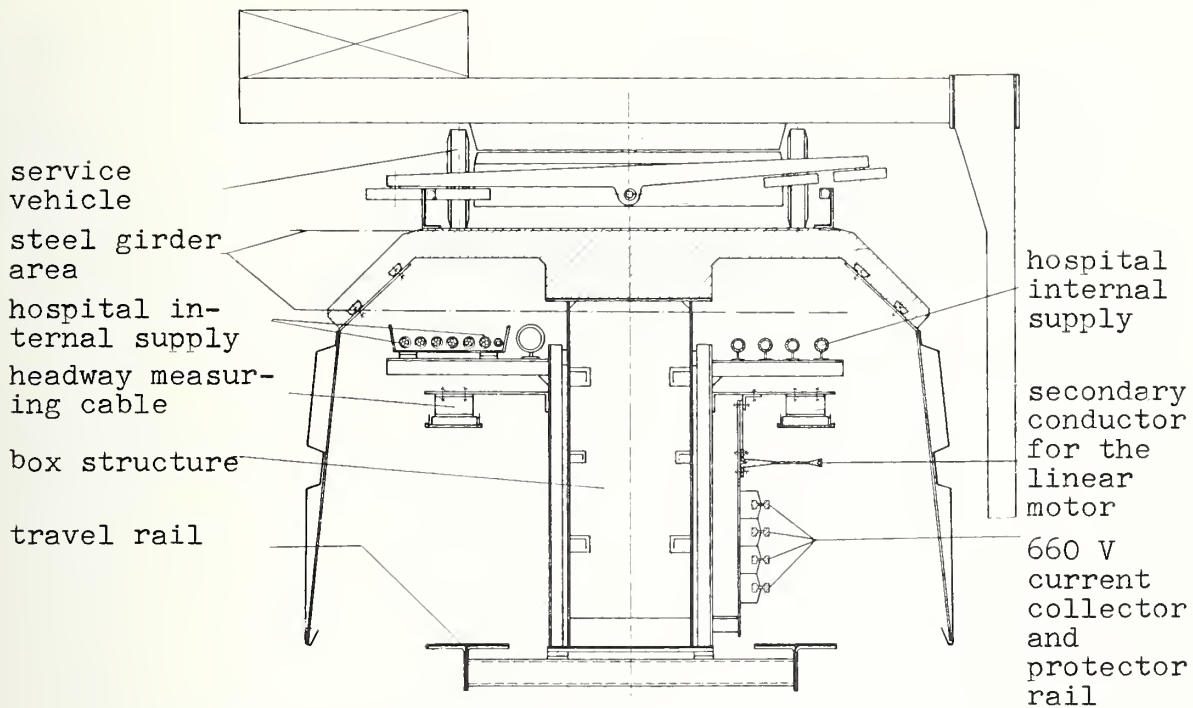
Cross-sectional View of Cabinlift Suspended Beam (first developed for the Cabinlift in Bremen)
